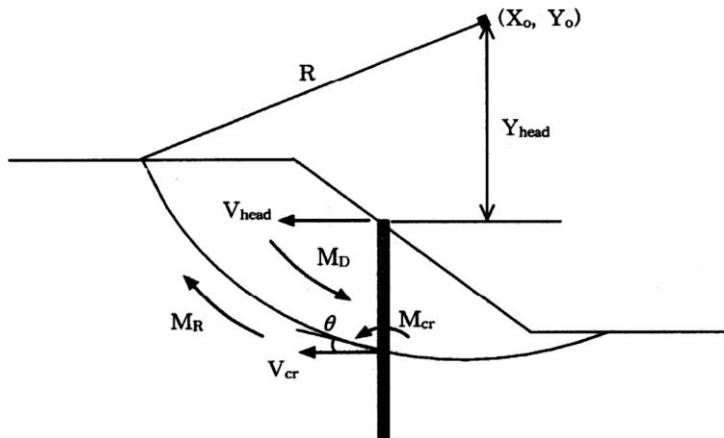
Forces on stabilizing piles and slope (after Jeong et al., 2003)
